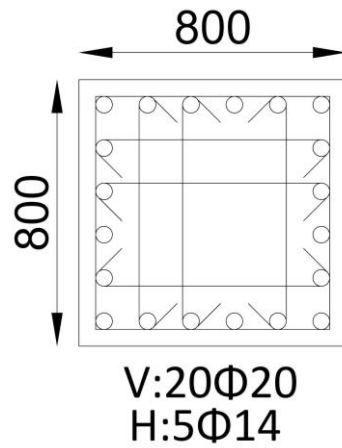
Column Longitudinal Reinforcement for Stories Between 21 - 30
